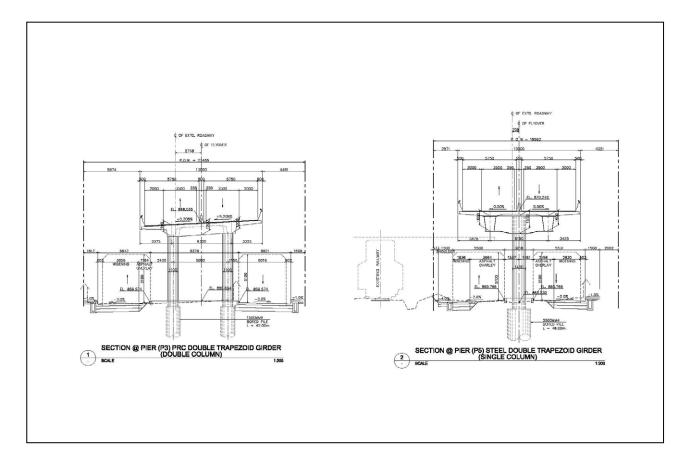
TYPICAL CROSS SECTION (NAGREG)
